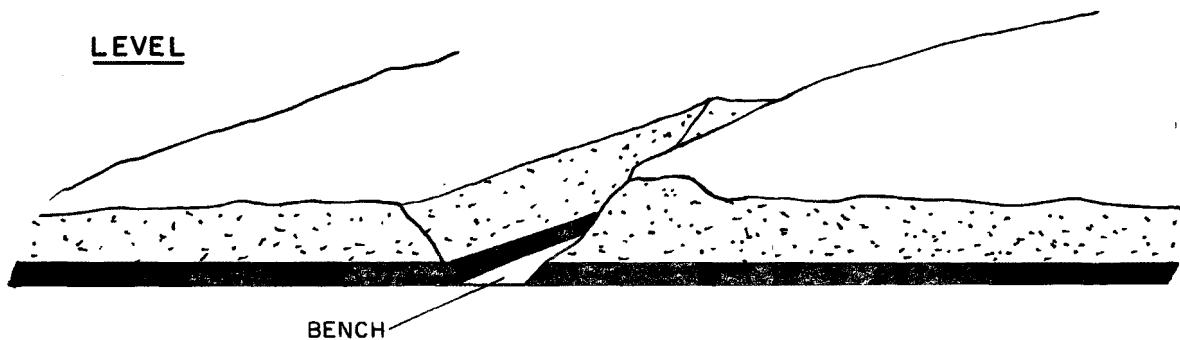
CROSS-SECTION VIEW OF LONGWALL STRIPPING SYSTEM ALONG HIGHWALL.
